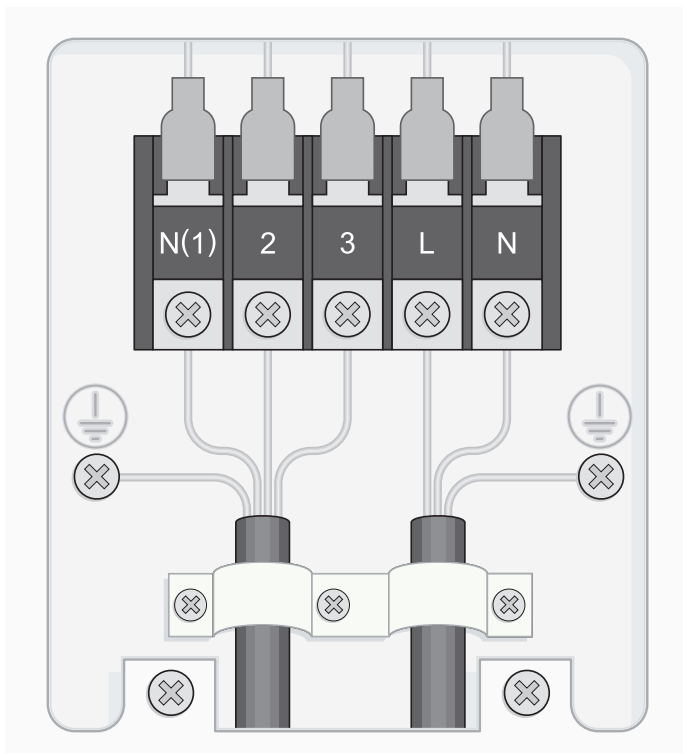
Electric connection to the outdoor unit 3-050 WNO.
